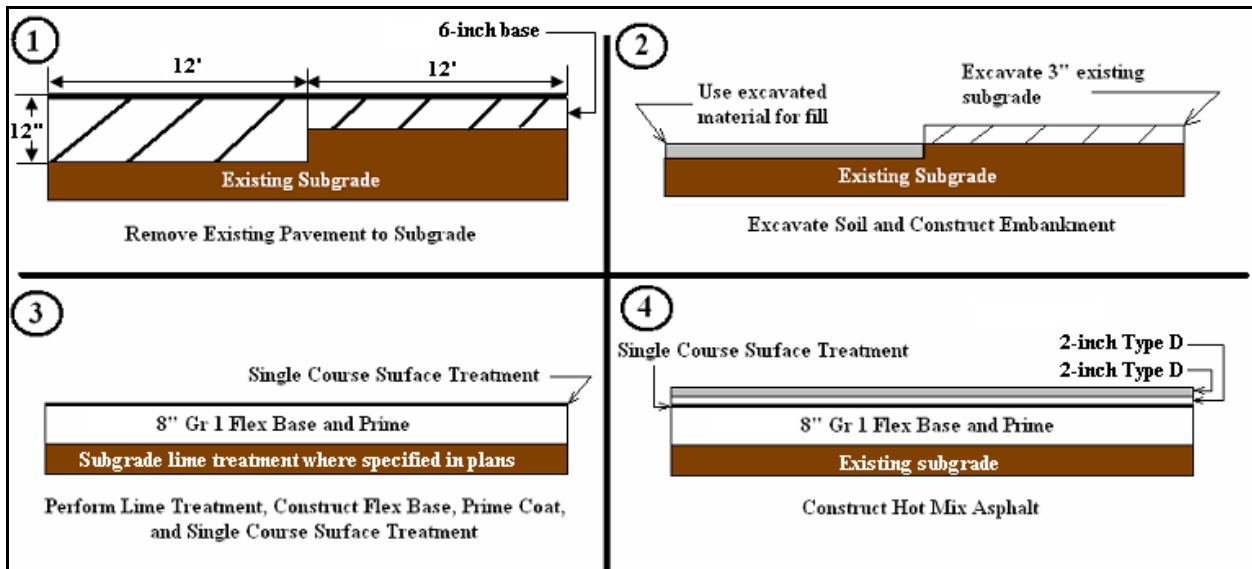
Sequence of Test Track Construction (Elevation View Looking North).
